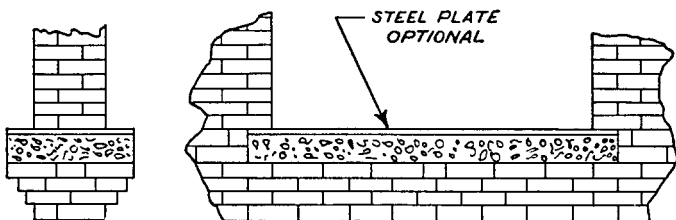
Concrete sill supported by a corbel of brick used with combustible floors.
